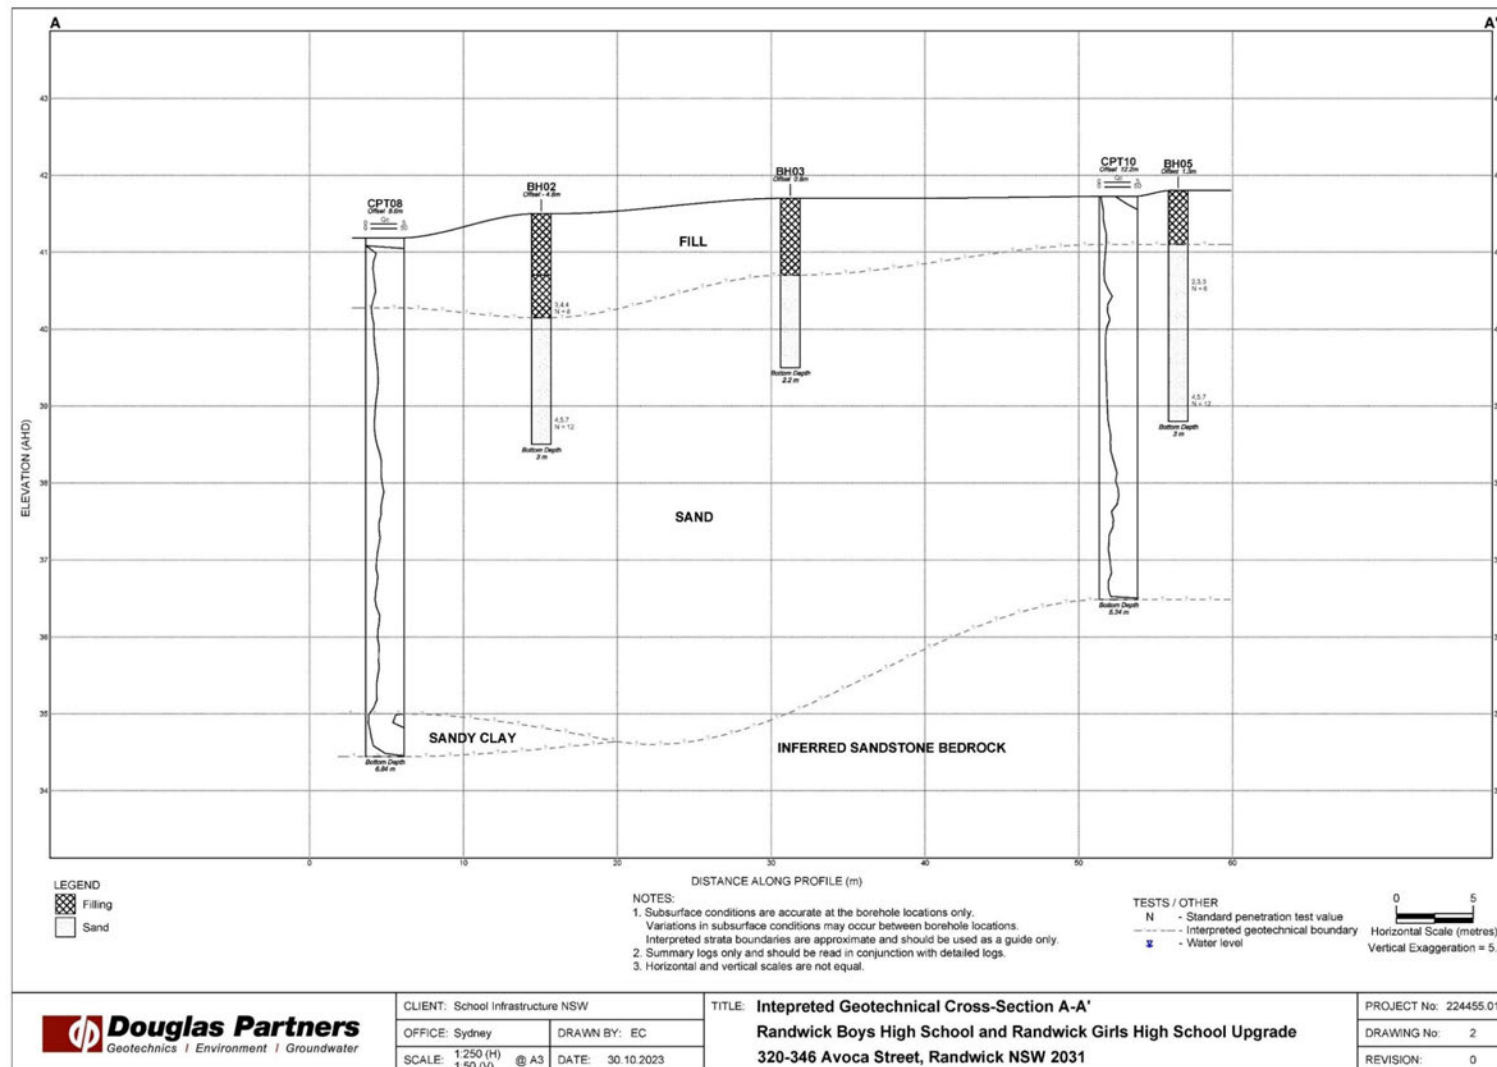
Geotech cross section E-W, (Douglass Partners 2023)
